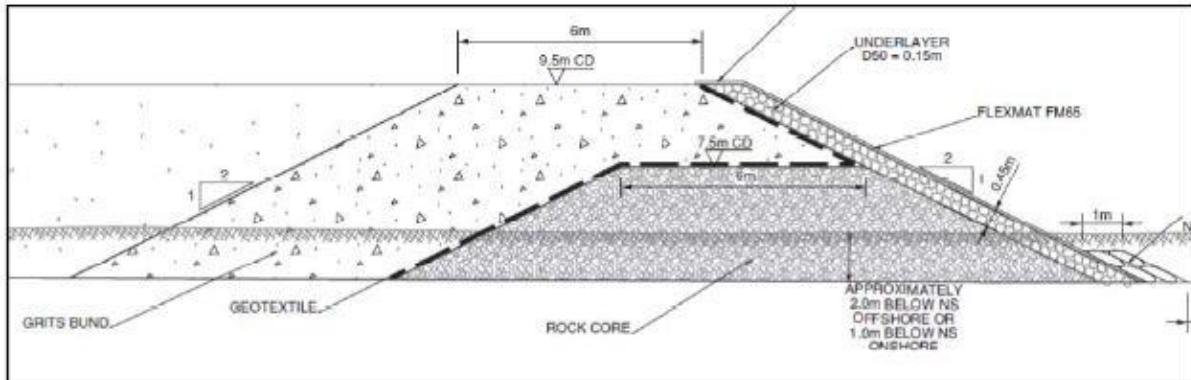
Typical section of rock & 'grits' perimeter bund and slope protection
